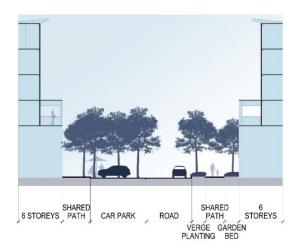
Daly Street Plan Extract and Indicative Cross-Section
